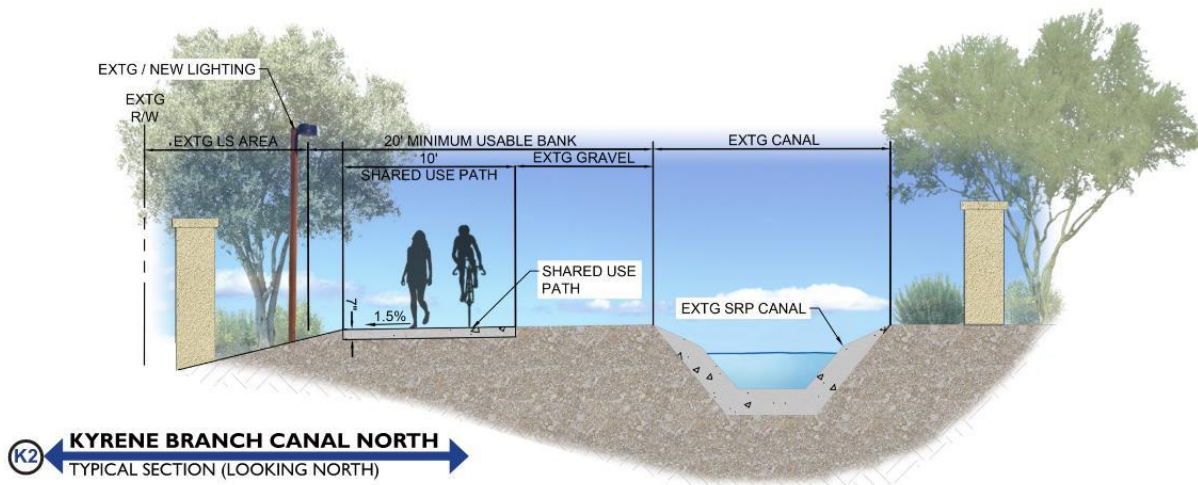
Shared Use Pathway Typical Section - Kyrene Branch Canal North - Segment K2
